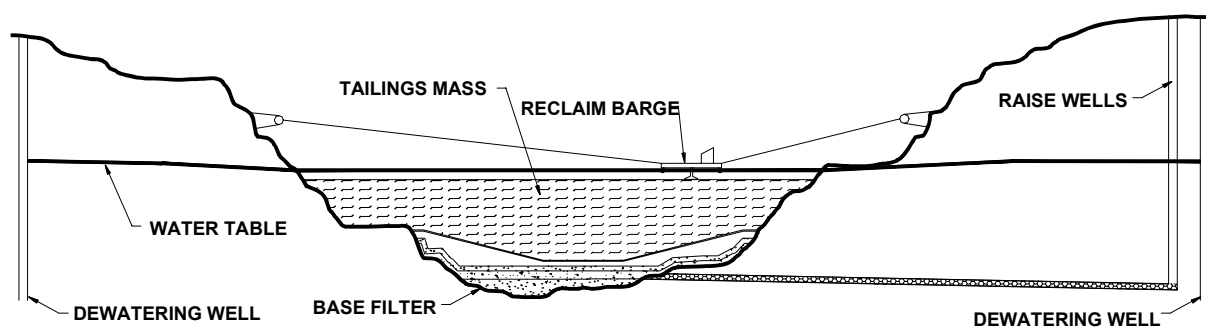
Section thorough JEB Pit pervious surround tailings management facility.
